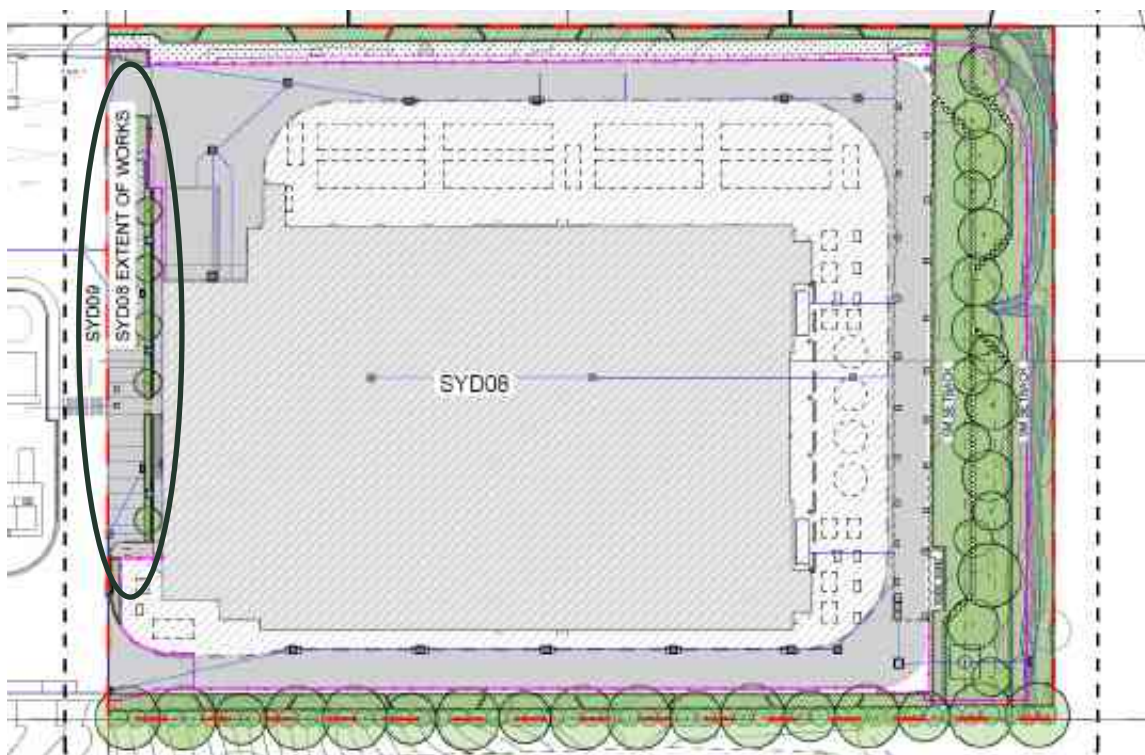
Site plan showing inclusion of planting along the perimeter of the carpark
